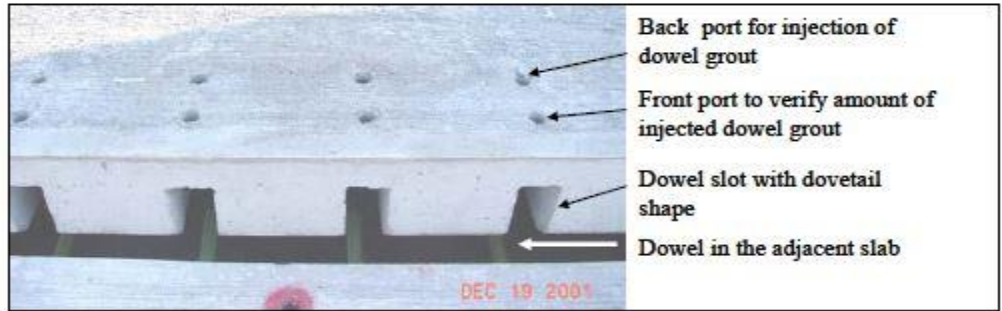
Fort Miller Precast Concrete Repair Panels [3]
